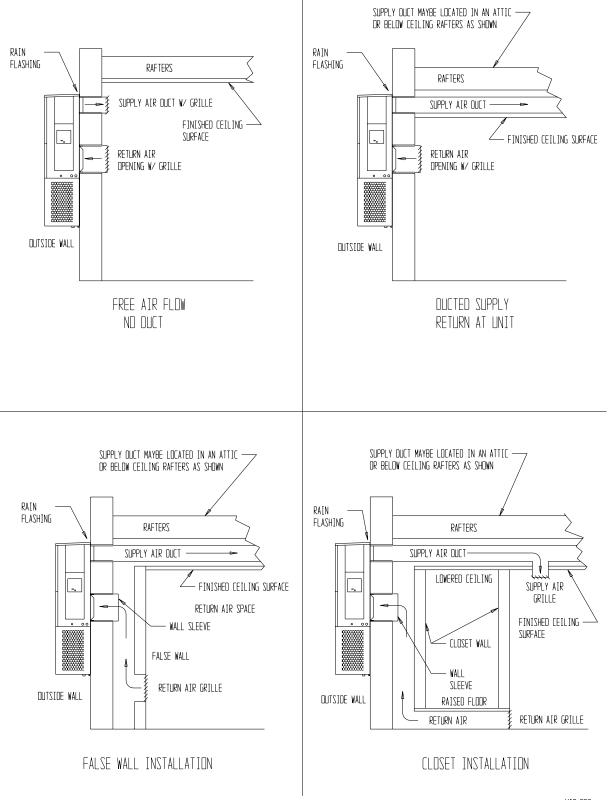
WALL-MOUNTING INSTRUCTIONS
